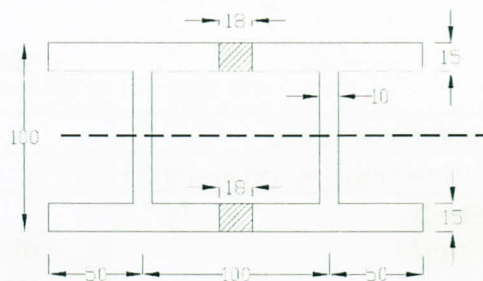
Cross-section of 1255mm x 200mm x 100mm plate girder
